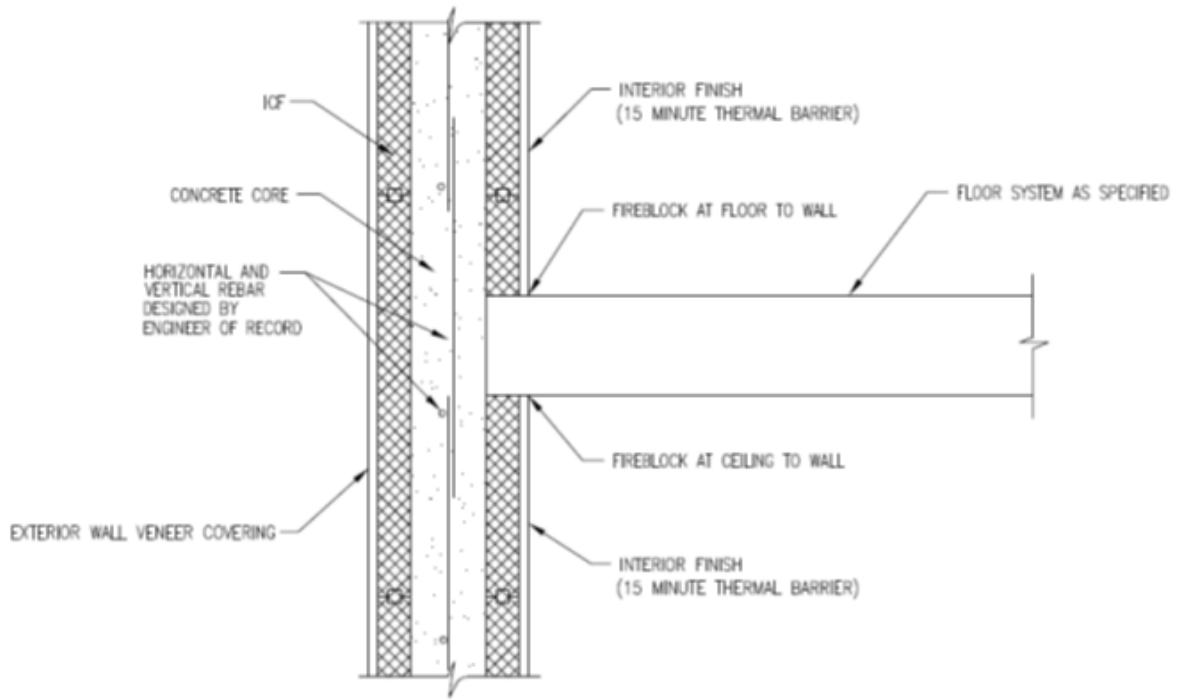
TYPICAL WALL-TO-FLOOR INTERSECTION FOR TYPE I, II, III AND IV CONSTRUCTION (IBC)
